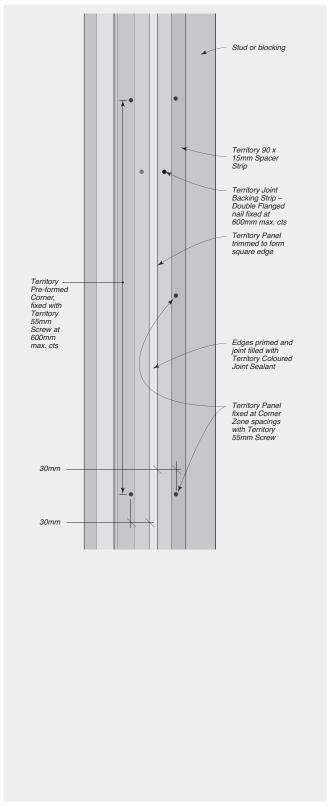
Typical Territory System Cross Section for Steel Framing – Elevation
